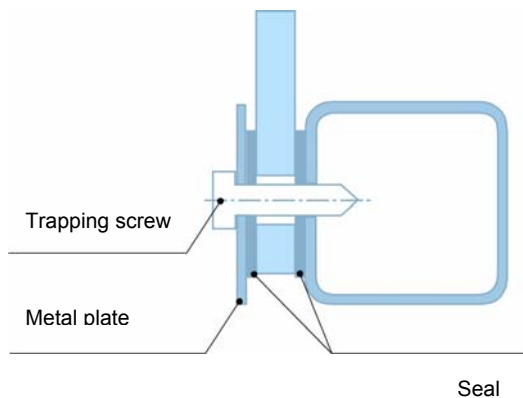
Avoid screws with beveled heads, which can cause cracking.
